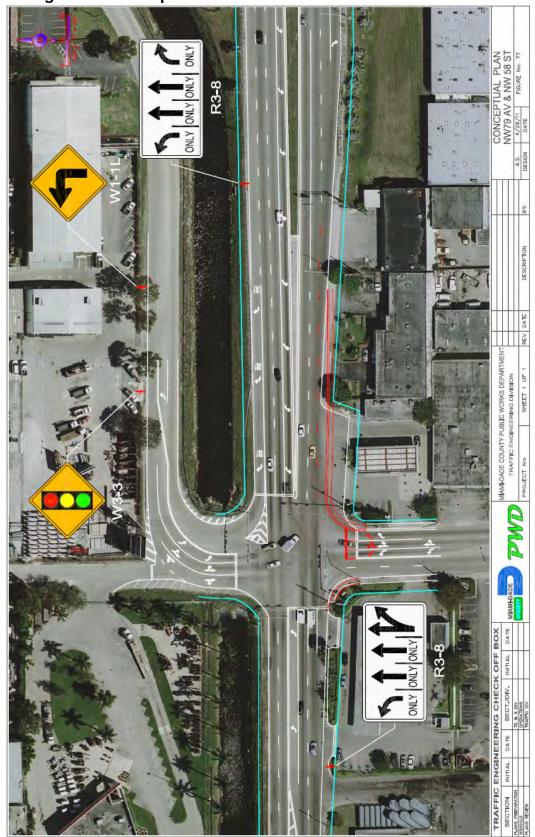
Conceptual Plan – NW 79 Avenue and NW 58 Street
